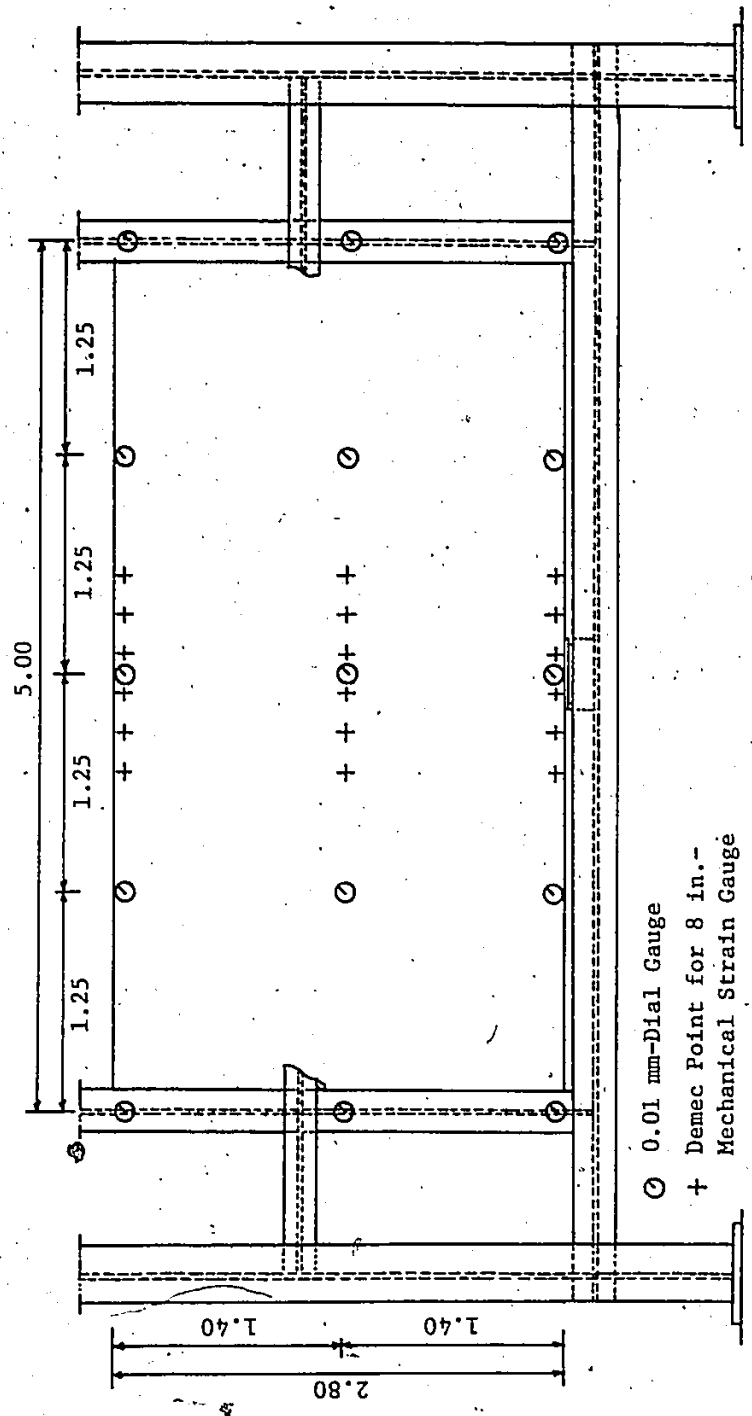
Instrumentation for Walls Supported Only on the Two Sides
